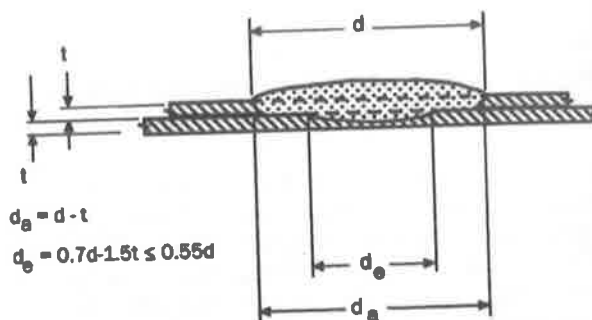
Arc Spot Weld – Sheet-to-Sheet
